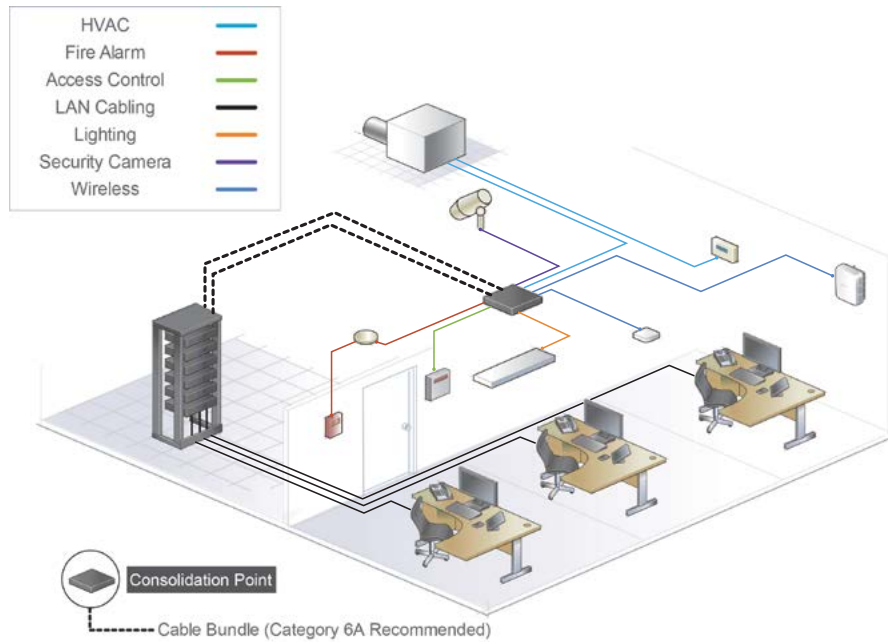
The Universal Connectivity Grid uniting all ceiling-based application cabling through a consolidation point with work station cabling deployed in a conventional star topology separately through a raised floor
